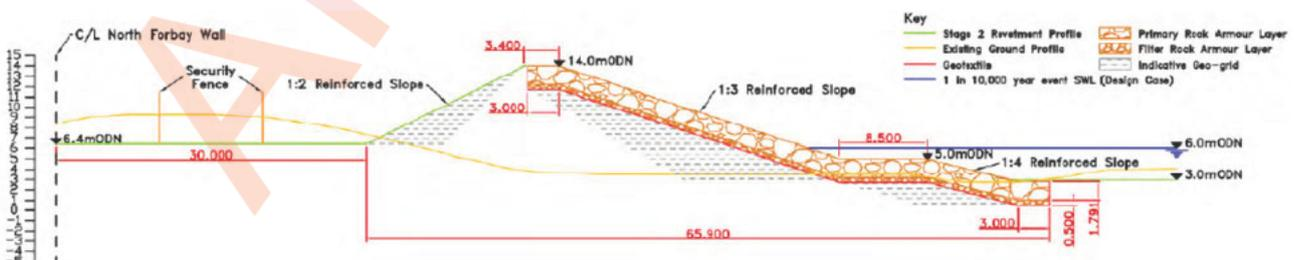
Cross-Section of SZC Sea Protection Embankment – Option 2.1, Stage 2 [15]
